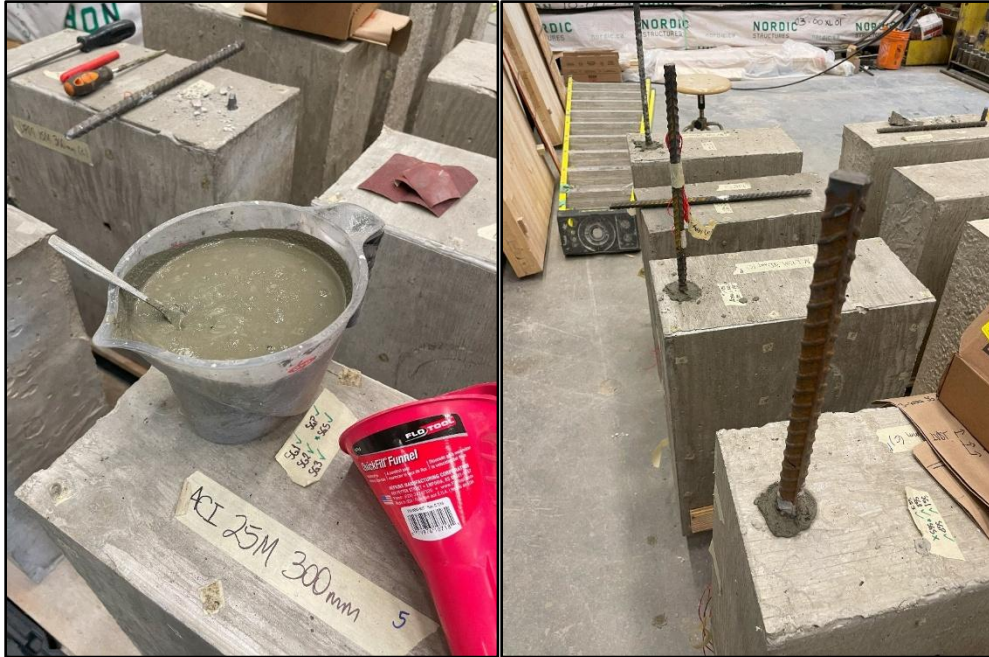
Grouting of the gaps between bond breakers and reinforcement.
